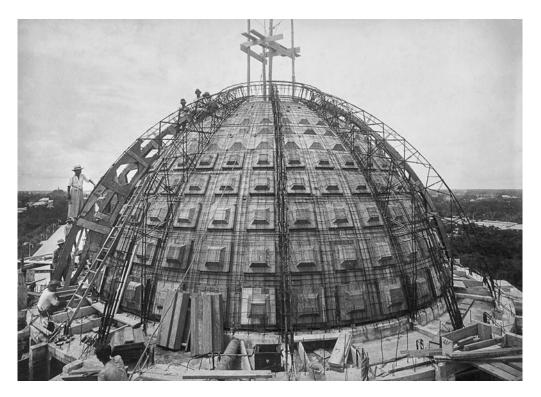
Reinforced-concrete dome of Ananta Samakhom Throne Hall under construction (c. late 1909).
